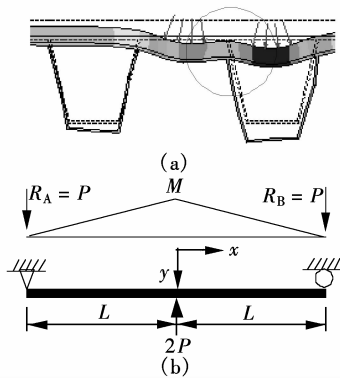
Equivalent beam of orthotropic deck pavement^[19].
